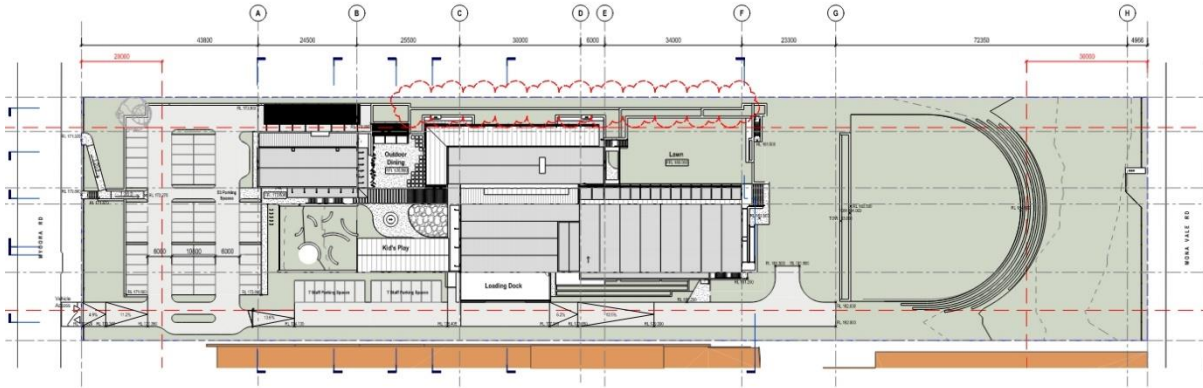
Proposed Development Plan (Extract from Architectural Plan)
